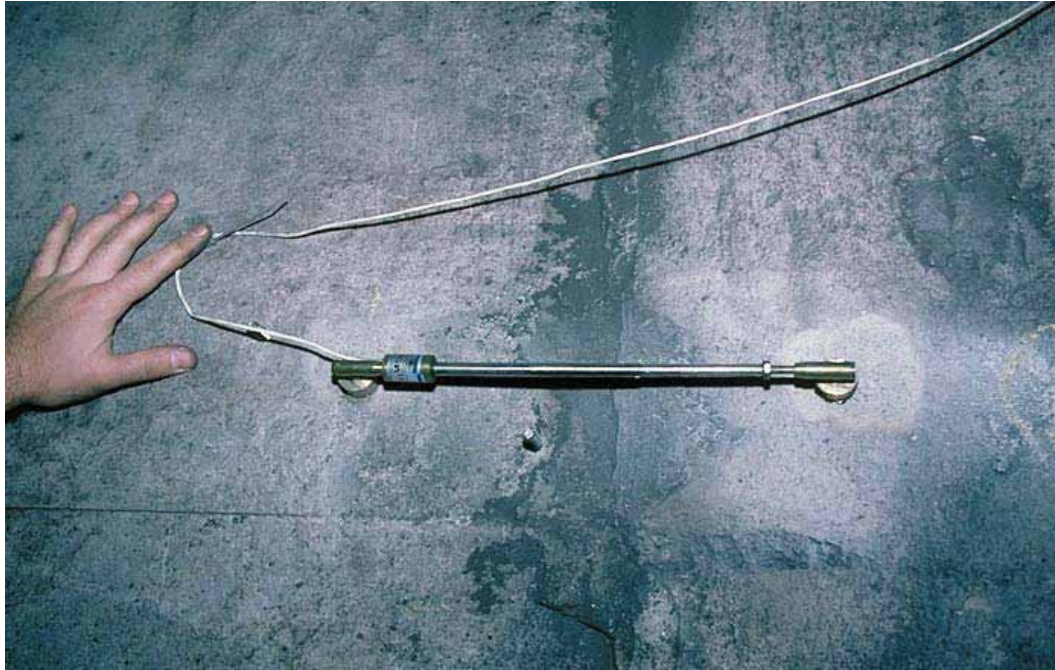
Jointmeter on tunnel wall to monitor rock joint opening/closure.
